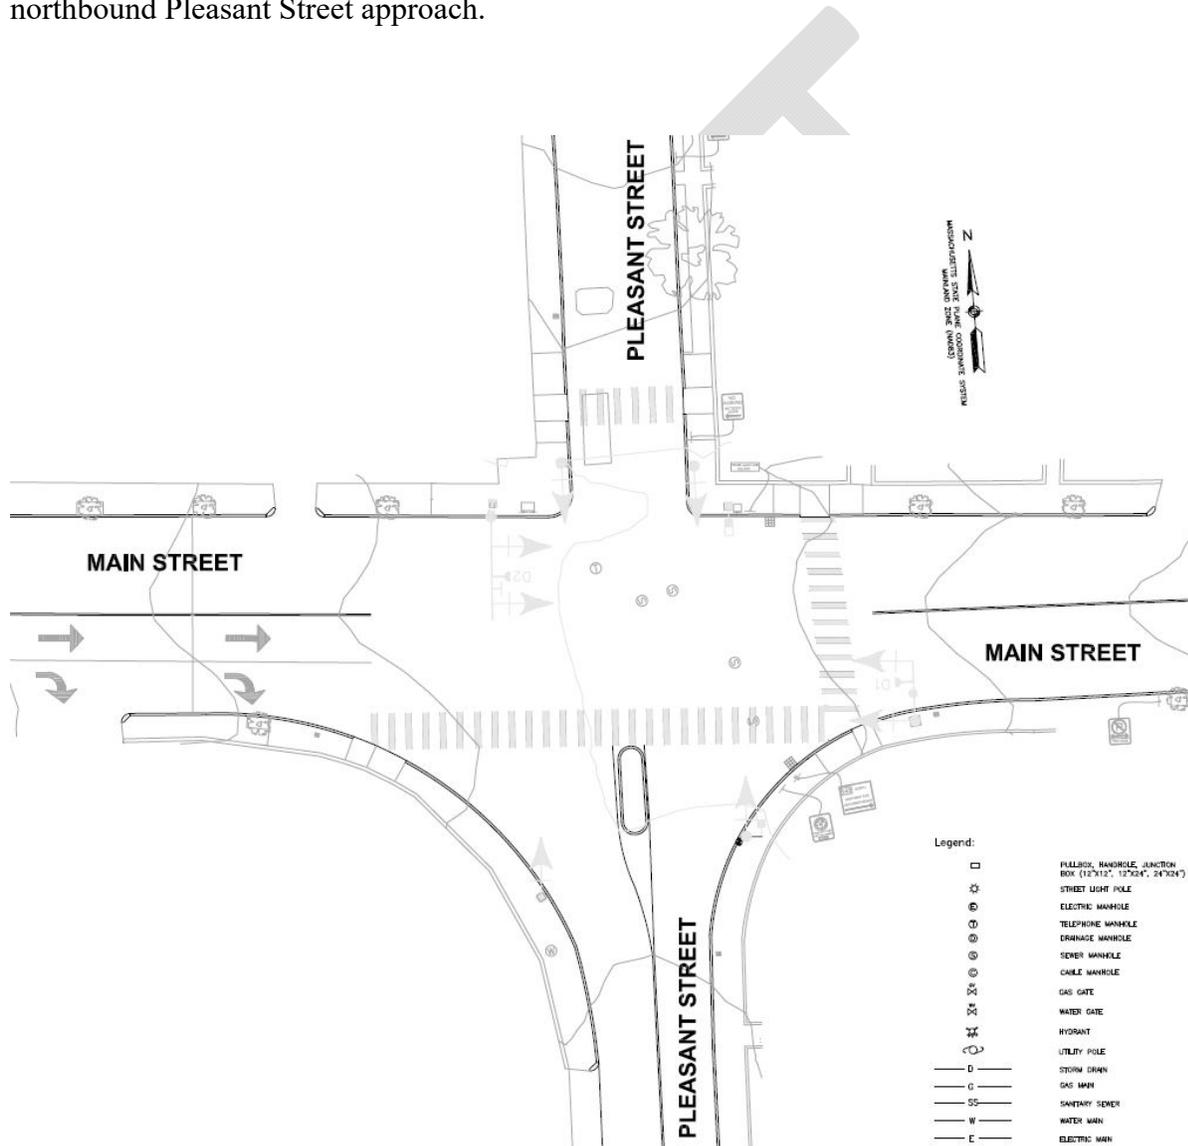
Existing Conditions - Intersection of Main Street at Pleasant Street
